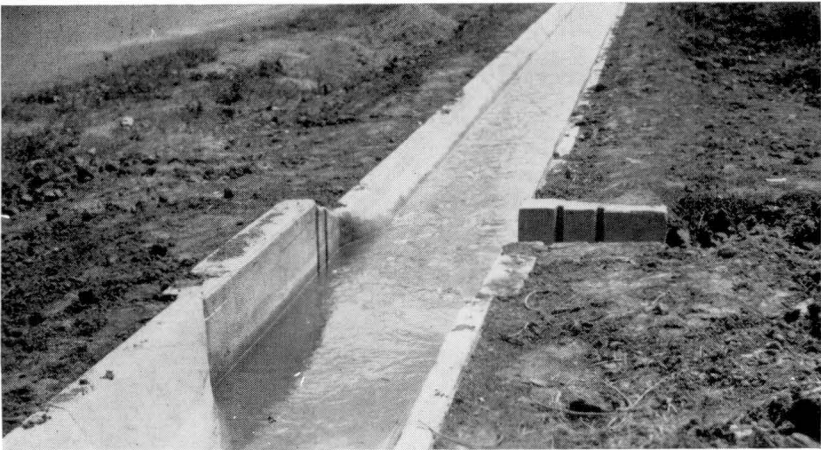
Finished section of concrete lining of farm lateral, College East Farm, Fort Collins, Colorado.
